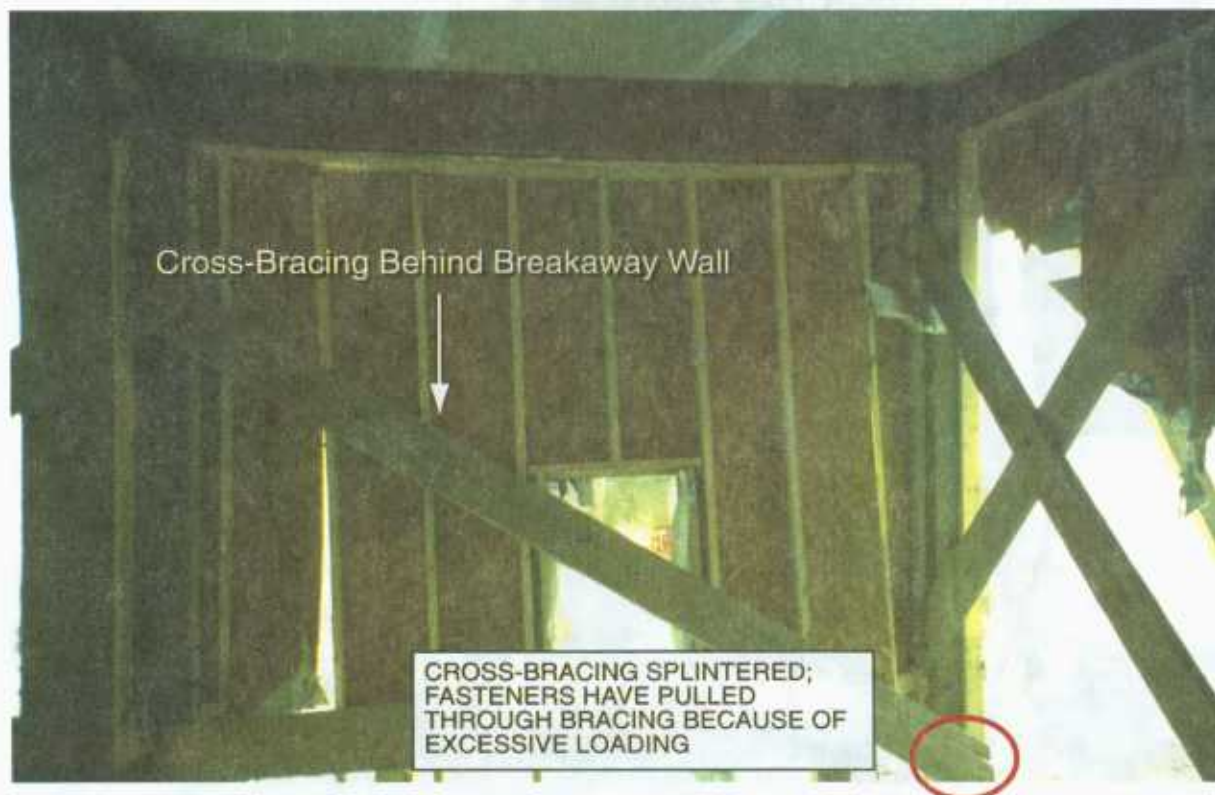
Improper installation of breakaway walls (on the seaward side of cross-bracing) resulted in failure of cross-bracing. Note breakaway wall pushed against cross-bracing.
